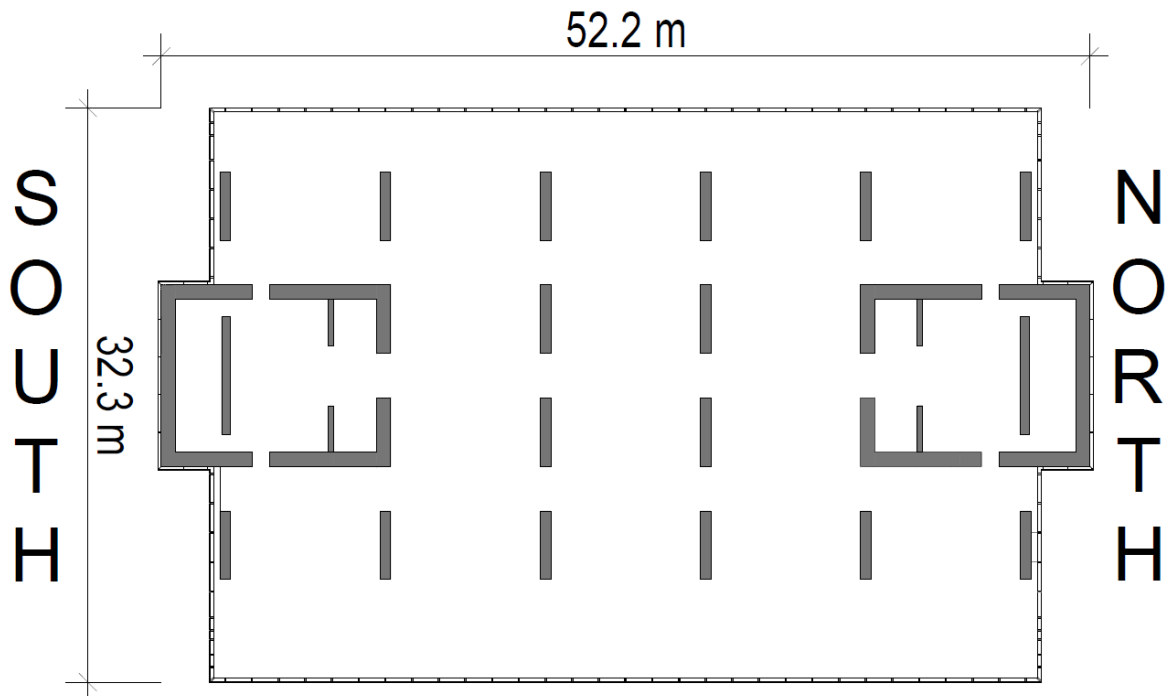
Typical plan view (the figure shows the 9th floor).
